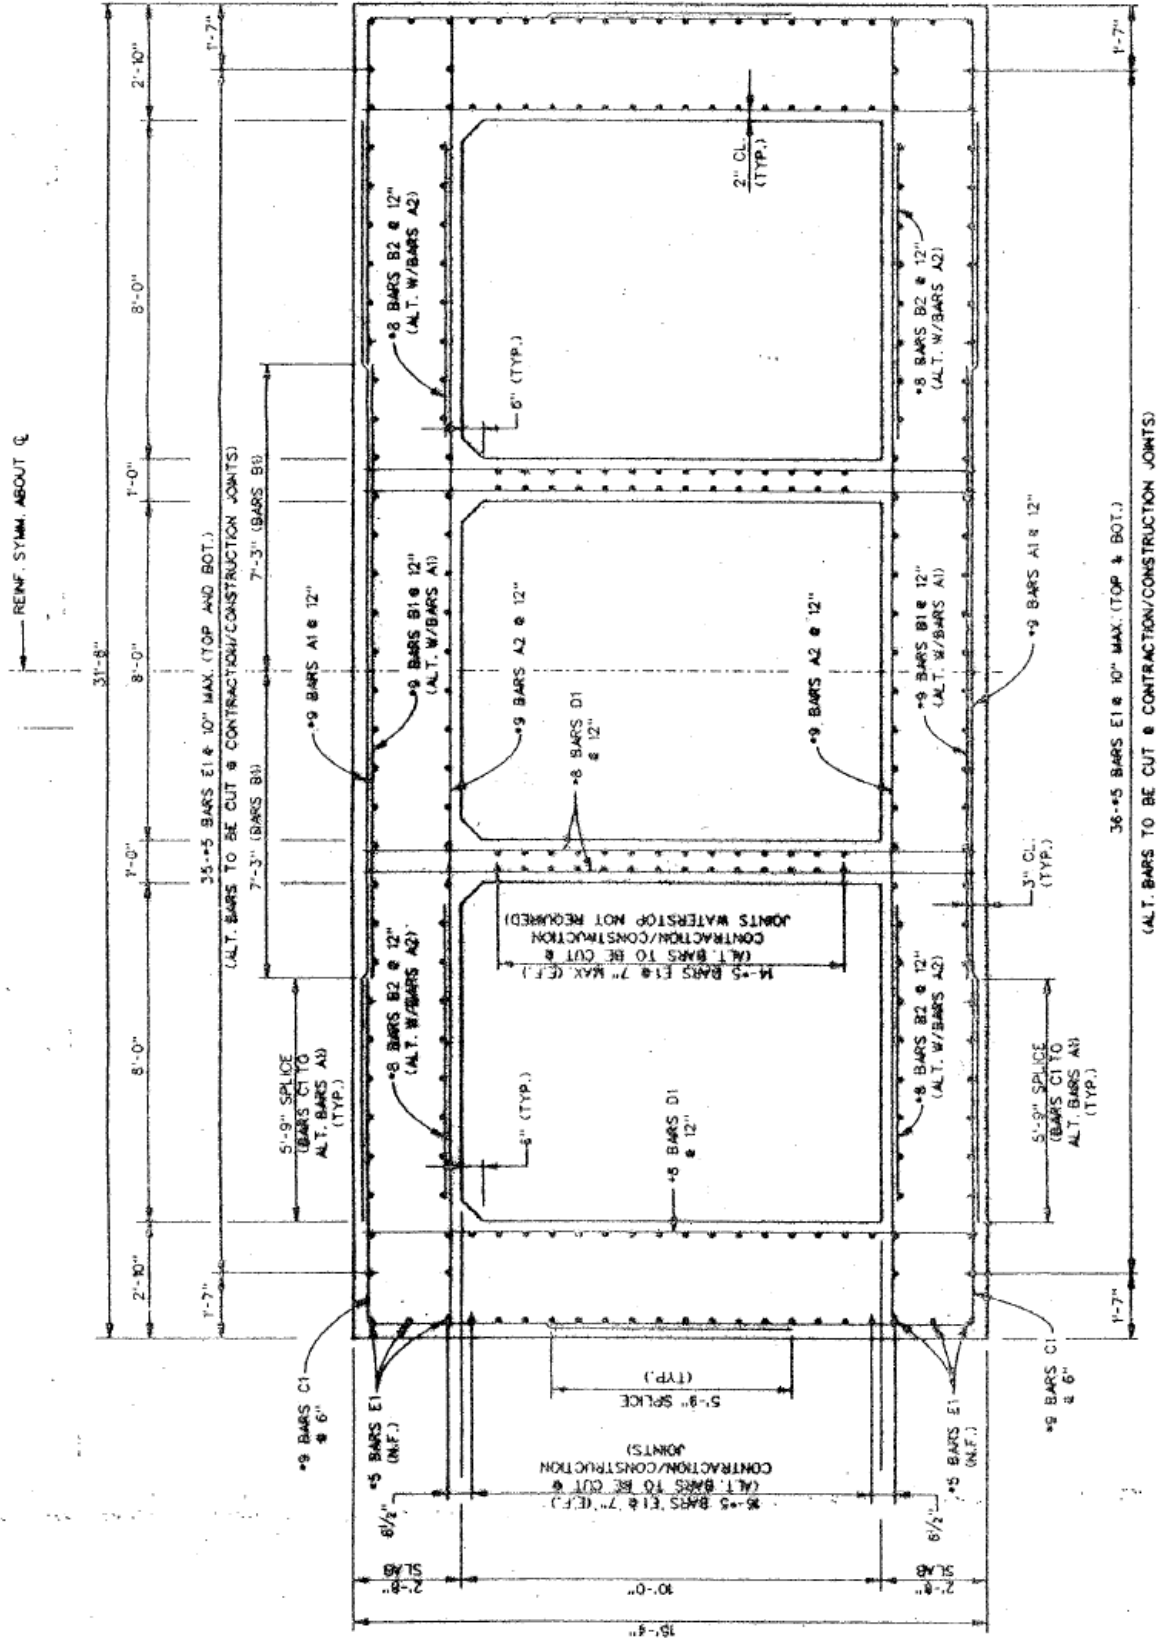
Corridor X Culvert at 4959+43 Cross Section (ALDOT 2000b)
